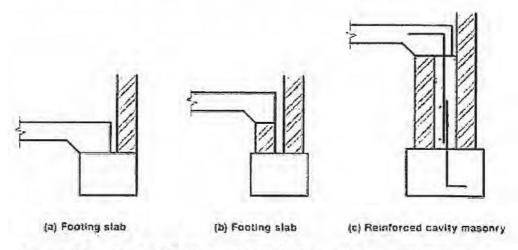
EXAMPLES OF FOOTING SYSTEMS REQUIRING JOINT TREATMENTS
